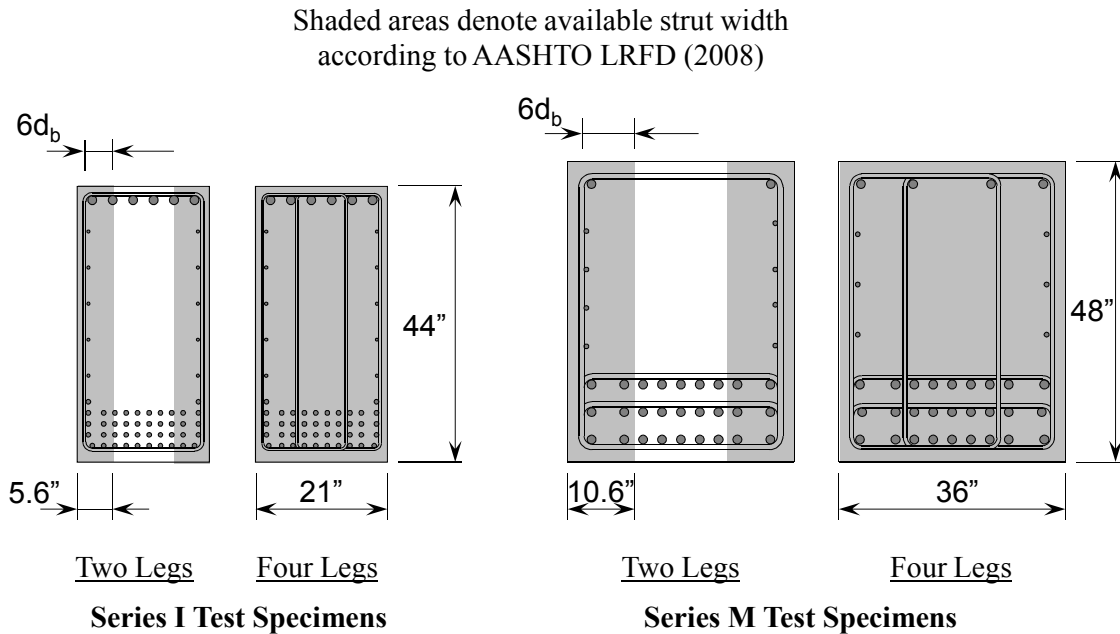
Effective strut widths at CTT nodes for specimens with 2-leg and 4-leg stirrups
